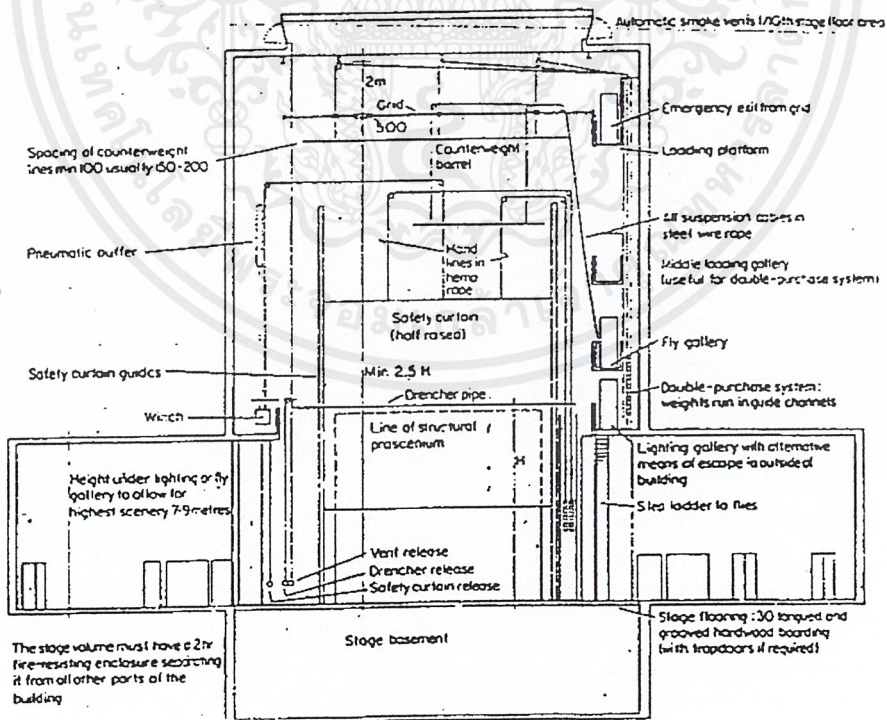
Typical section through stage and fly tower looking towards auditorium
